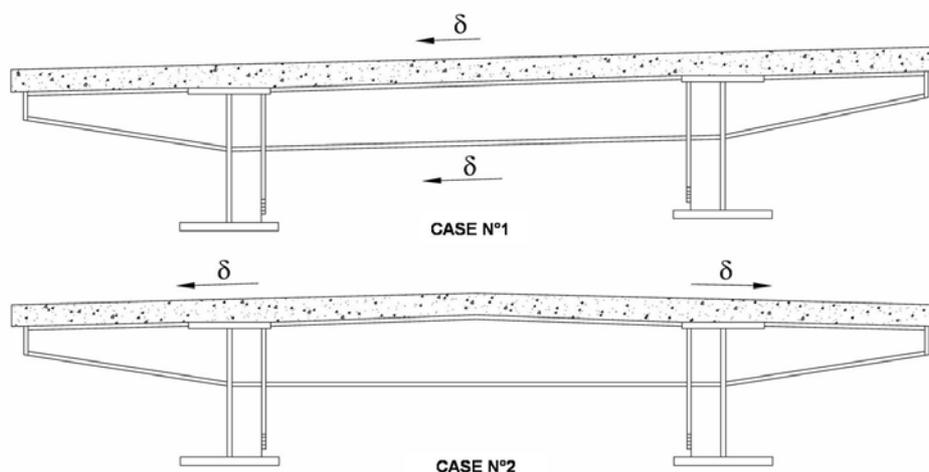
Influence of deck banking on directly supporting cross-beam shape
